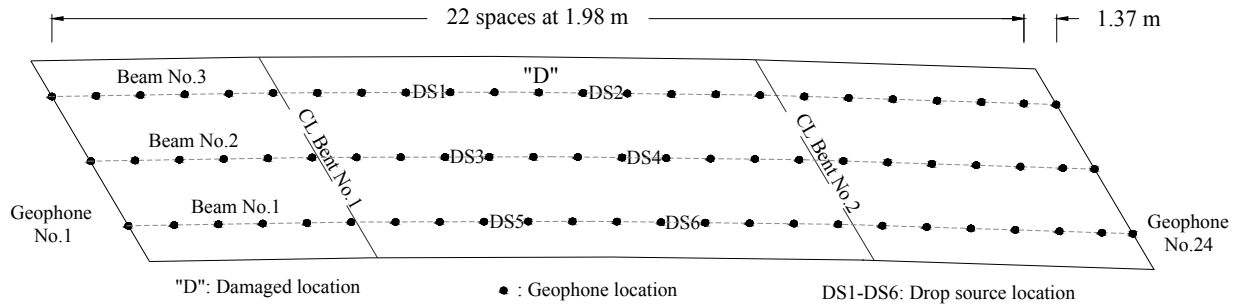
Plan view of the entrance ramp to James White Parkway from I-40 westbound
